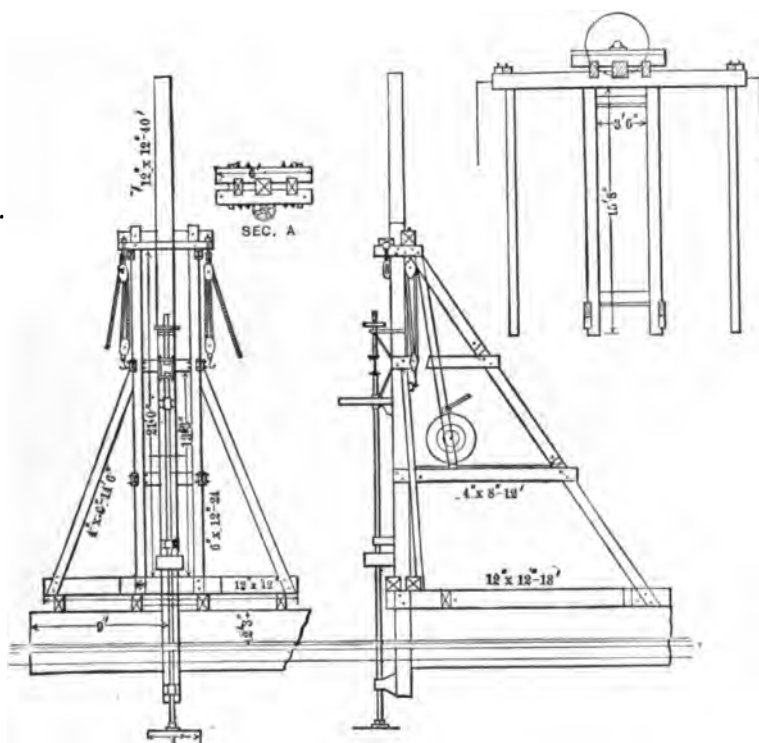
MACHINE FOR SAWING OFF PILES UNDER WATER.
